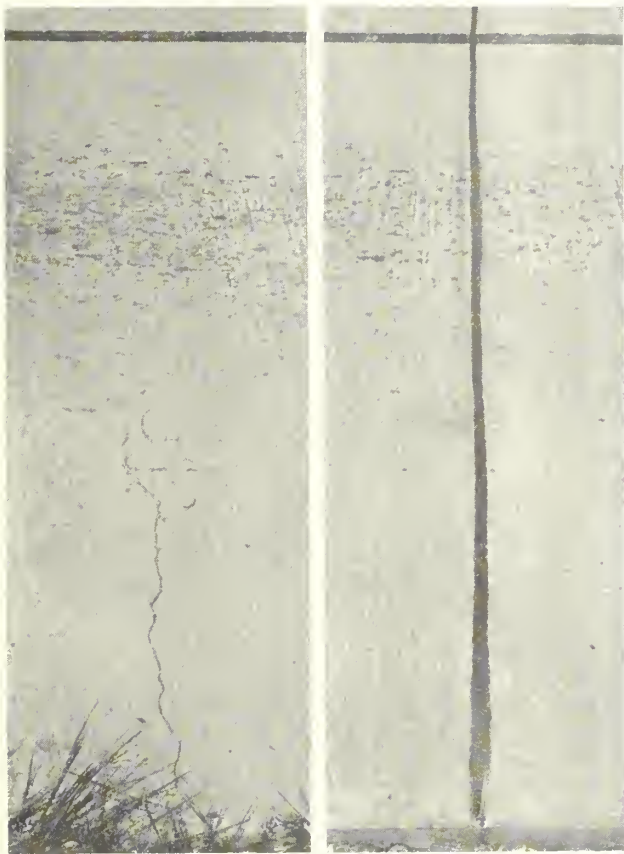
LEFT, CRACK THAT HAS OCCURRED AT A SUBMERGED WEAKENED-PLANE JOINT; RIGHT, WEAKENED-PLANE JOINT WITH SURFACE GROOVE.
